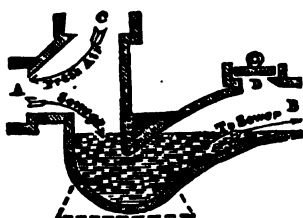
Disconnecting and Ventilating Drain Trap, No. 2, Buchan's Patent.
